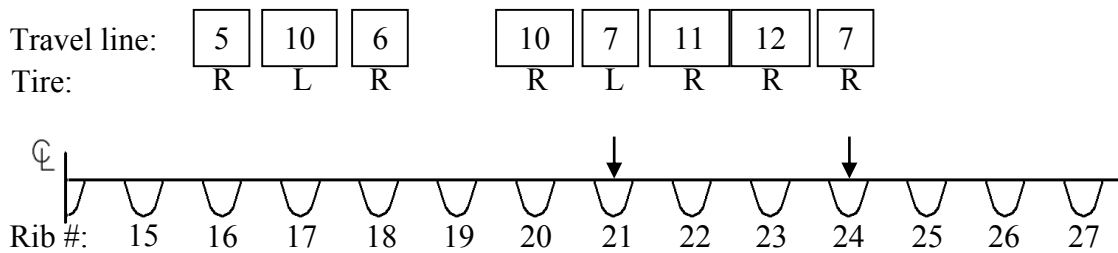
South side of bridge, static positions; wheel loads shown for longitudinal travel line 7.
